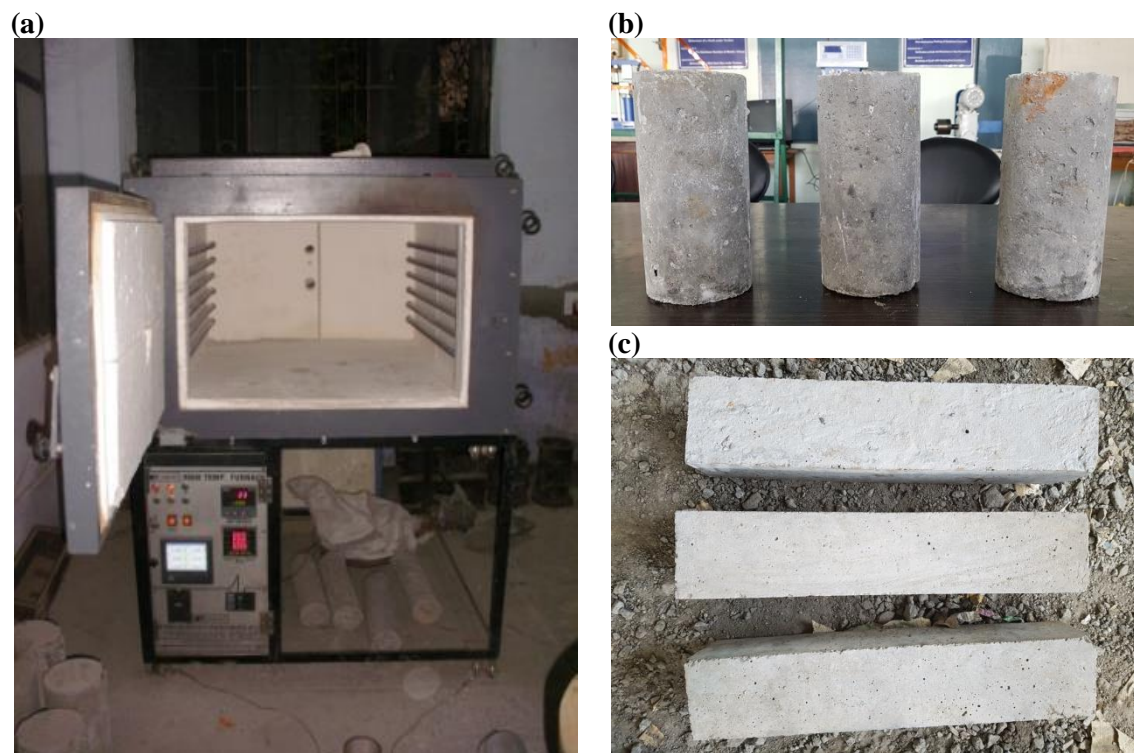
(a) Electrical furnace having temperature rating of 1150°C, (b) Cylindrical concrete specimens of grade M20 and M60 for split tensile test, and (c) Concrete prism specimens of grade M20 and M60 casted for performing flexural strength test.
